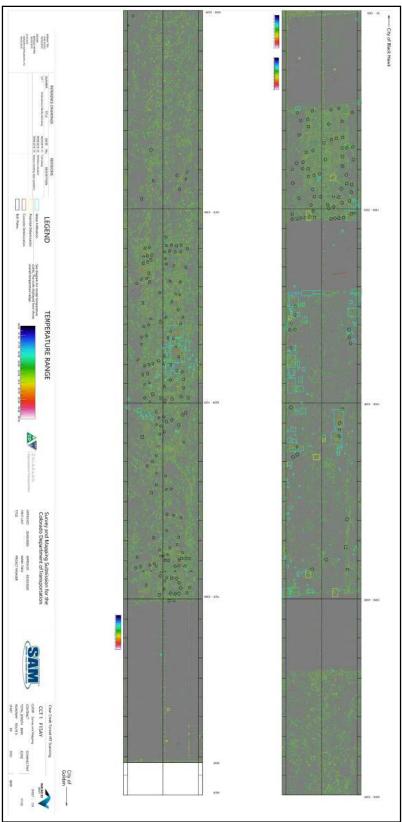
Tunnel 1 Auto Detection, Bolt Plates
